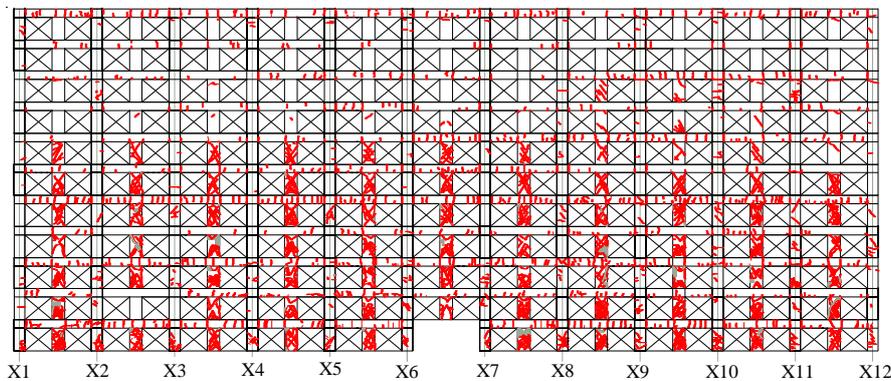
Elevation of a frame with crack map of a residential building damaged due to the 2011 East Japan Earthquake
